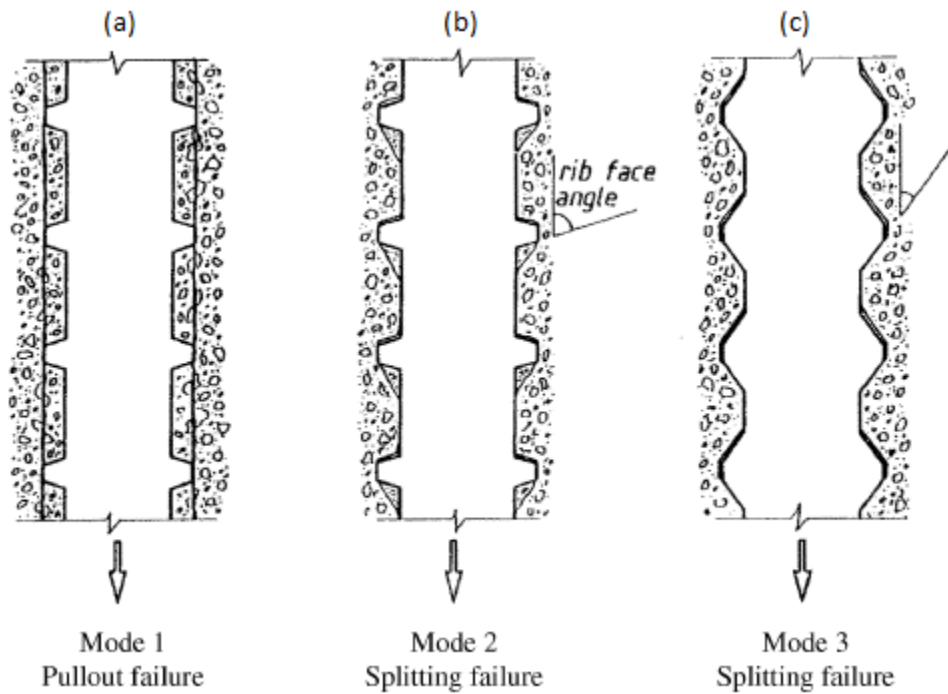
Bond failure modes of ribbed reinforcing bars (Cairns and Abdullah, 1996)
